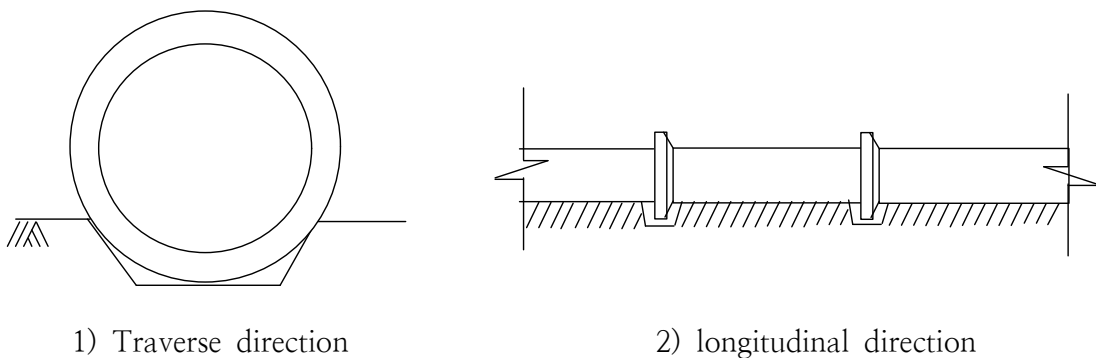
Bed Excavation for the Sewer Pipe Connection Parts
